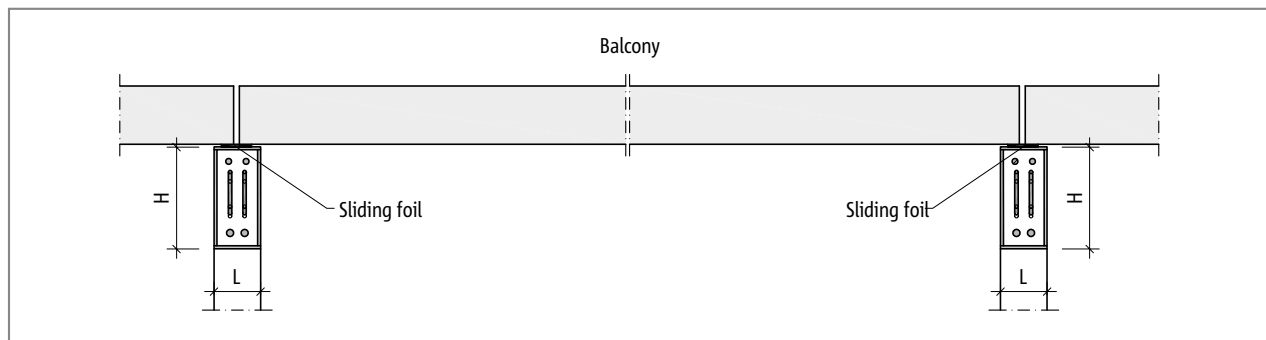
Schöck Isokorb® T type B: Cross-section; fatigue resistance via the sliding foil between the balcony slab and cantilevered beams
